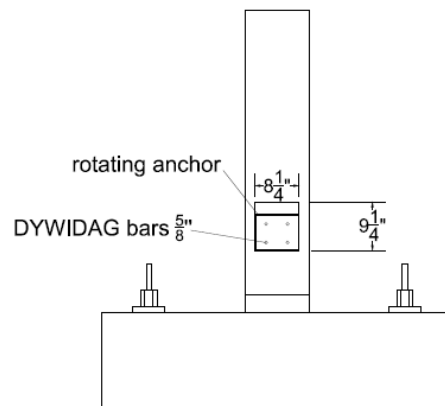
Side view in design drawings for Specimen 11 (Figure 7.2)
